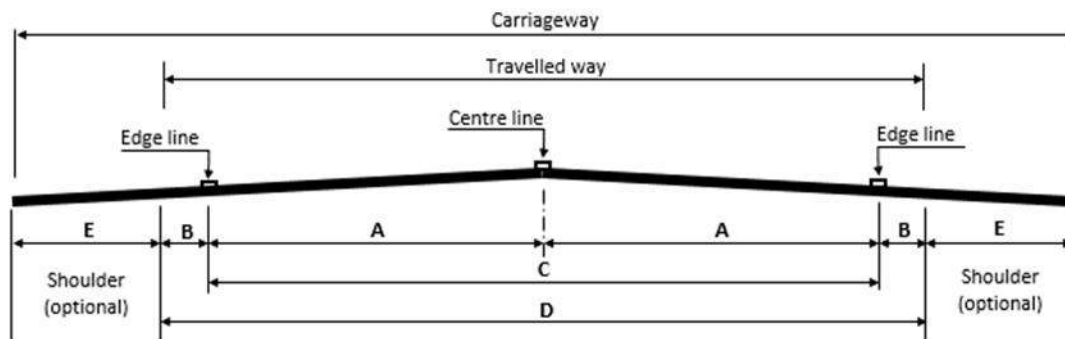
Road markings in relation to road width (see Table 4-4)
